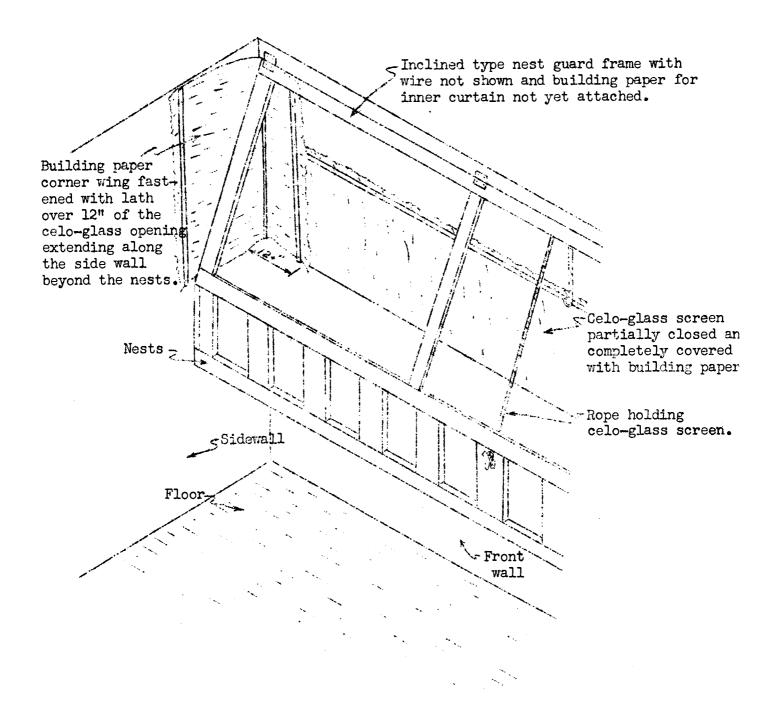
Detail showing method of installing corner wing or baffle to prevent light leaks around ends of inner curtain.
